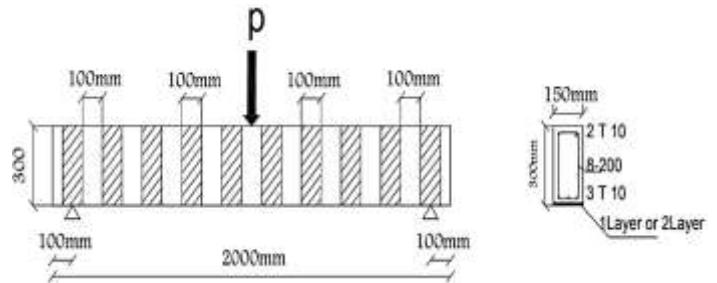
Strengthened RC beams with vertical strips and bottom layers of CFRP
